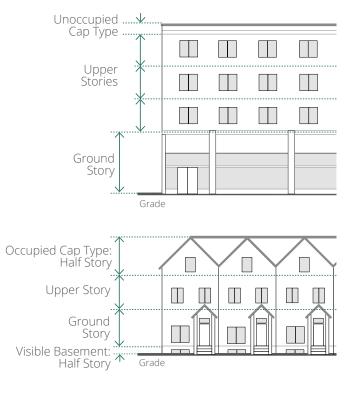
B-3. Measuring Stories with Floor-to-Floor Height
